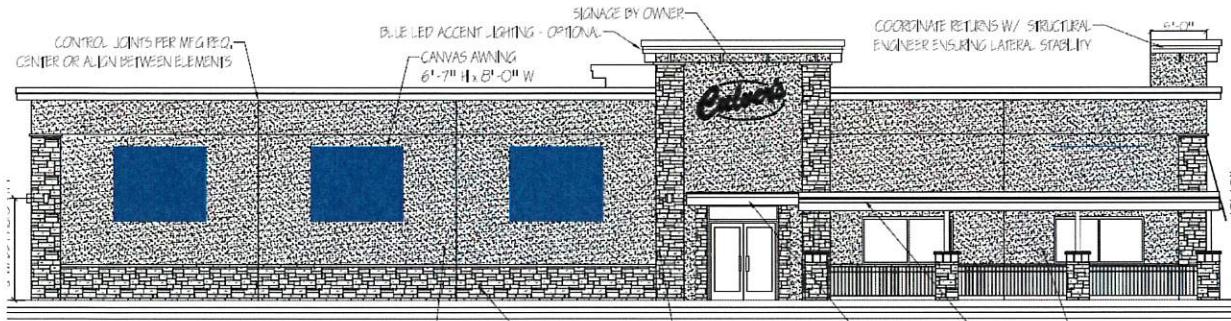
Façade Elevation Drawing of Proposed Culver's Restaurant
